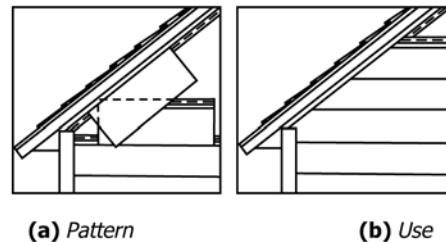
Using a Pattern to Match Panel End Cuts to Gable Angle
